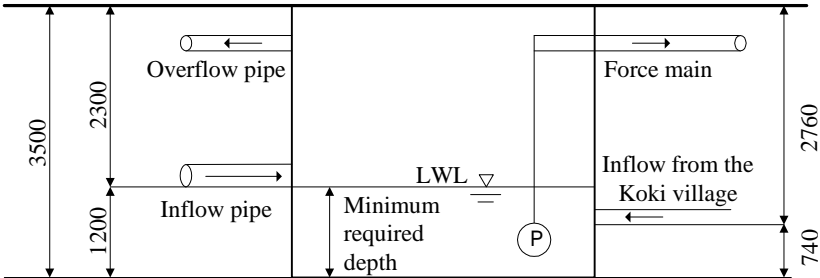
Existing Koki Pumping Station Section (Case 1)
